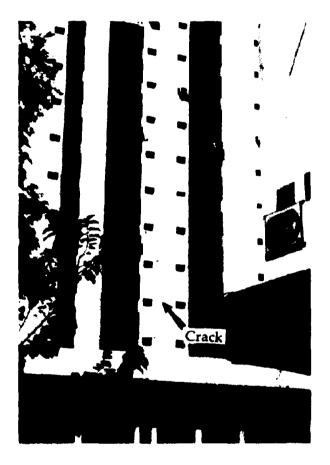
Nonstructural horizontal cracks in a 14-story concrete-frame building.
